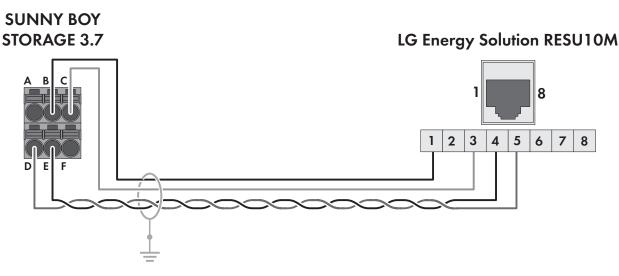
Cabling plan SBS3.7-10 with RESU10M
